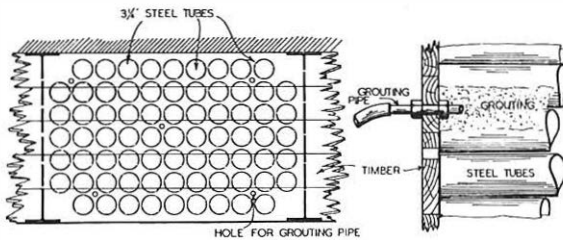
METHOD OF CEMENTING STEEL PIPES.
